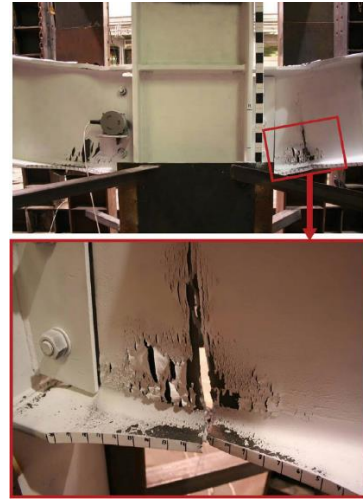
Test setup and for the double beam assemblies details (Sadek et al. 2011)
